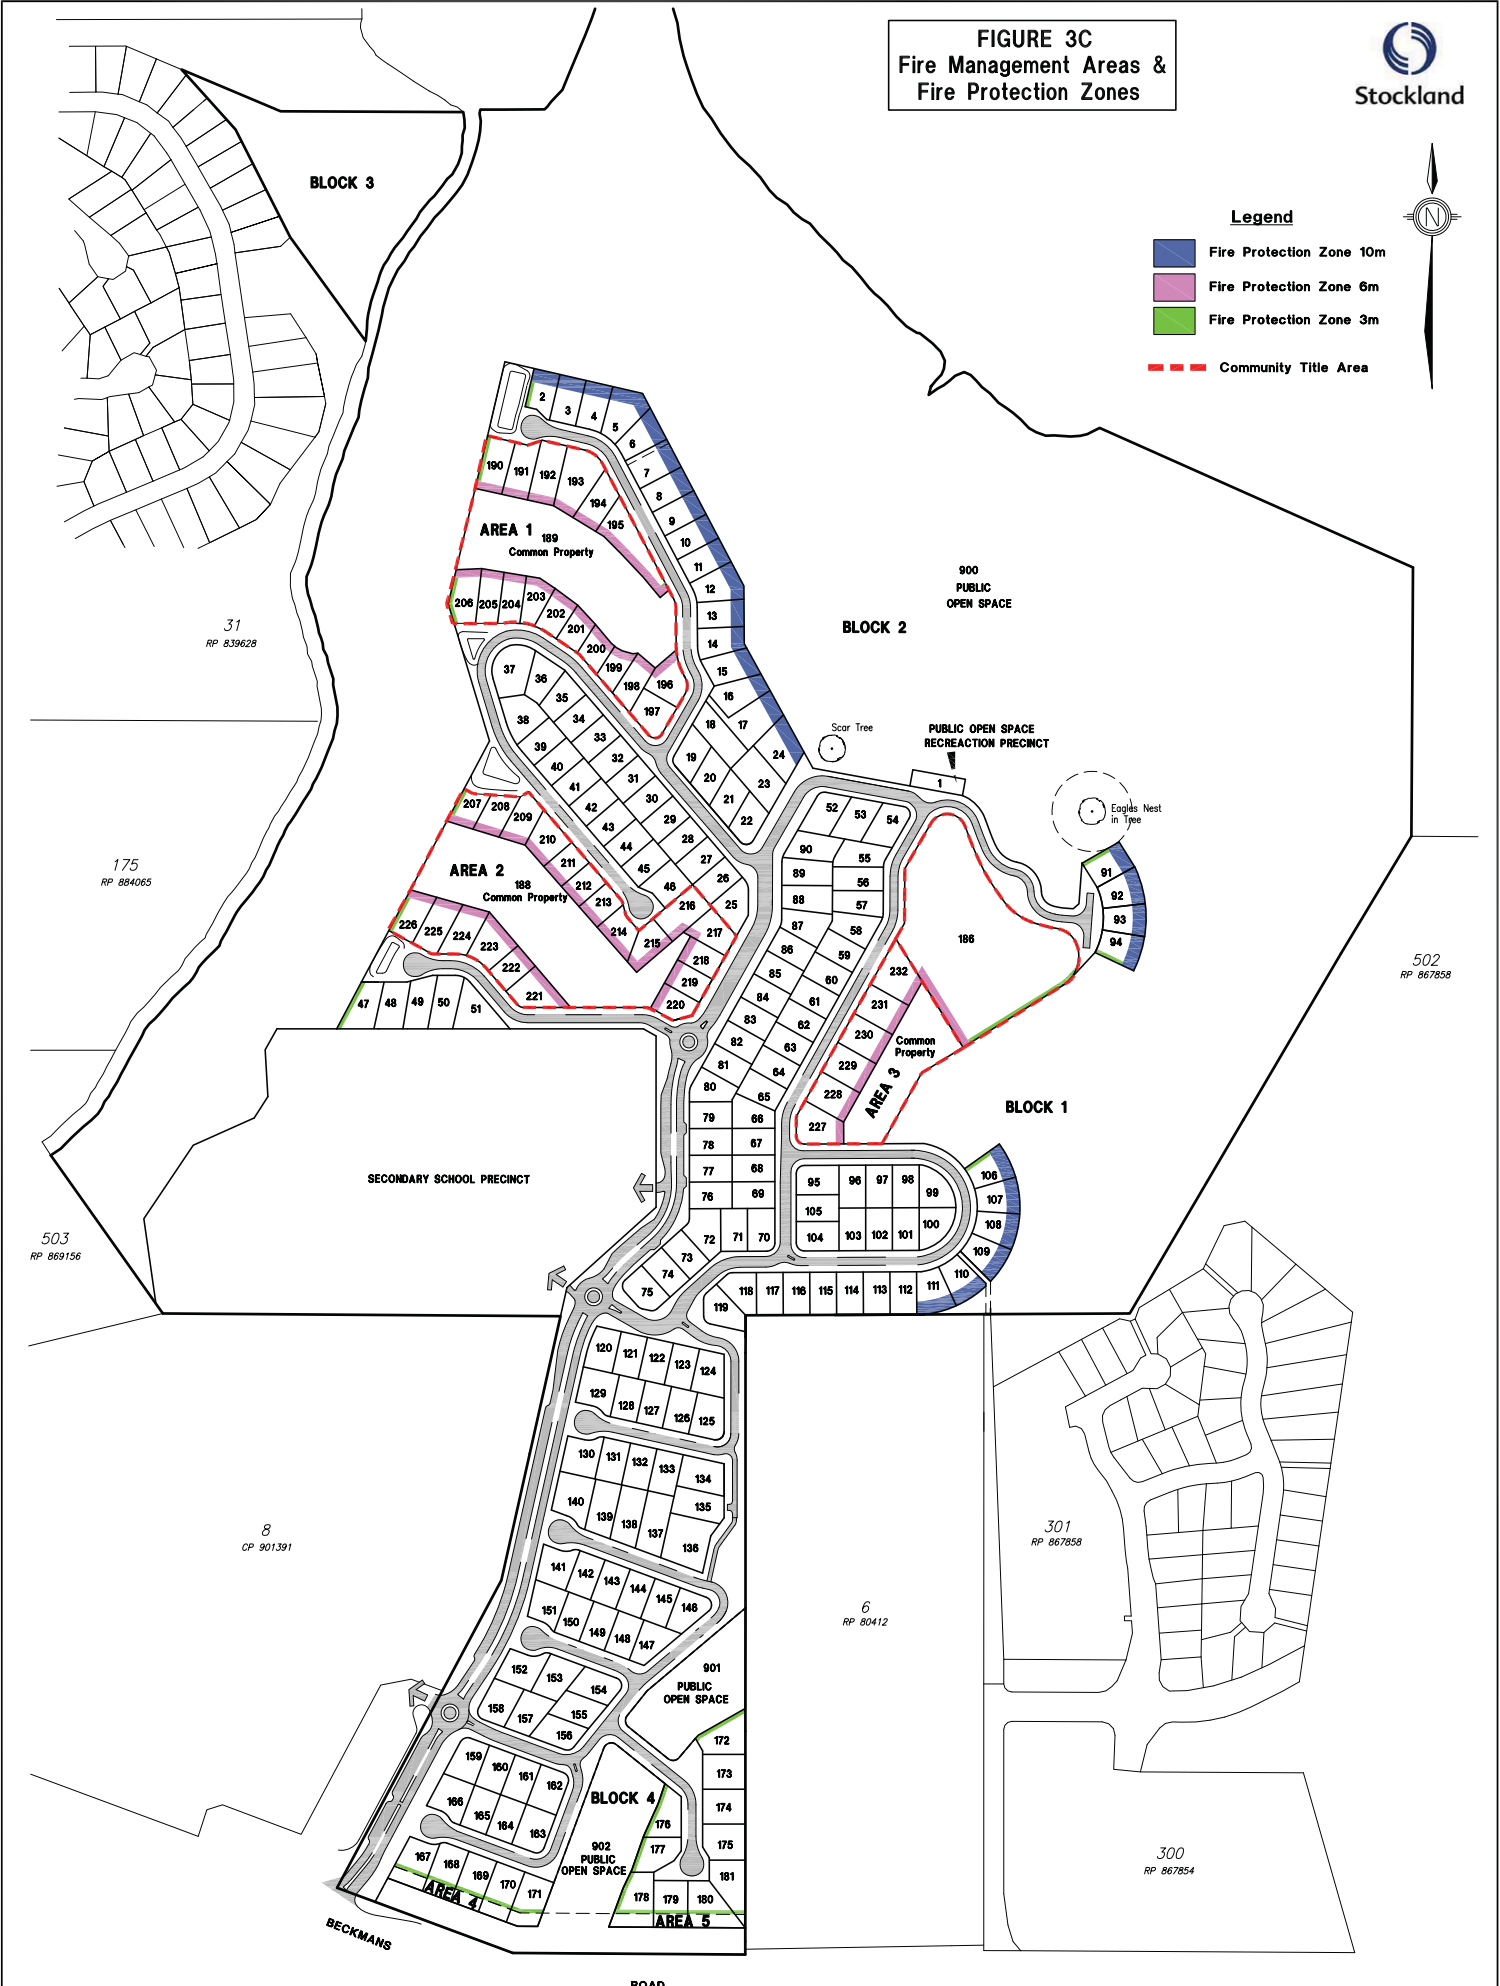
Fire Management Areas and Fire Protection Zones (Plan No. 6812-84) and
